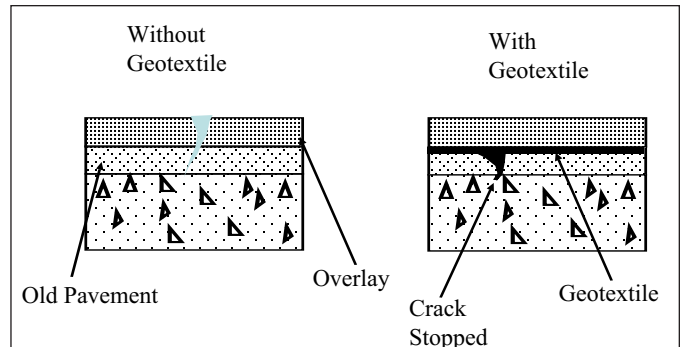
Use of GSE nonwoven geotextiles to prevent reflective cracking.
